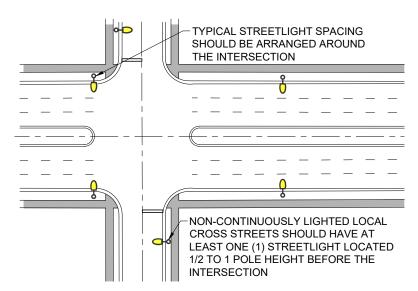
Typical Intersection Lighting Layout with No Signals and Continuous Lighting
